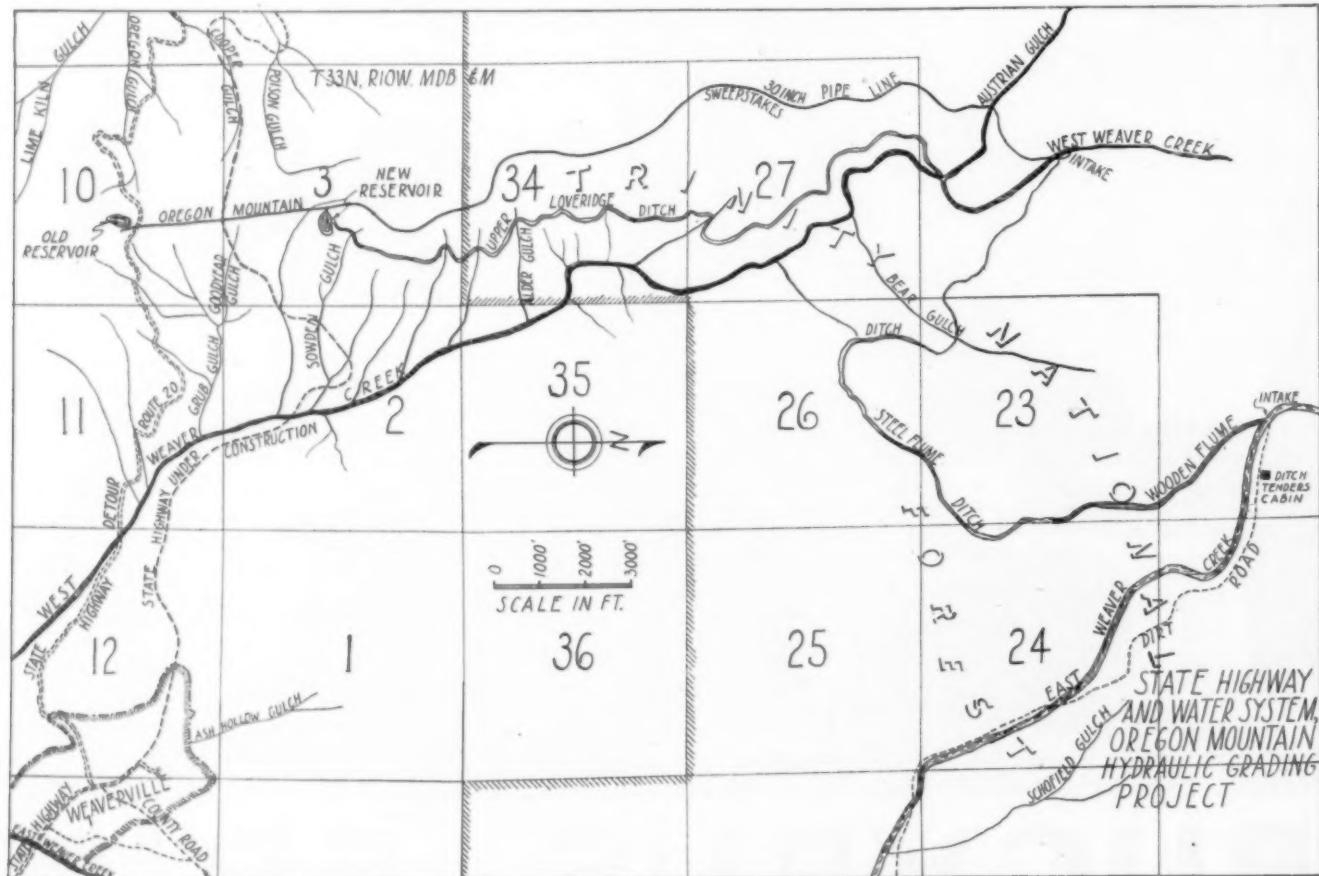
Water Collecting System for Oregon Mountain Highway Hydraulicking Job
